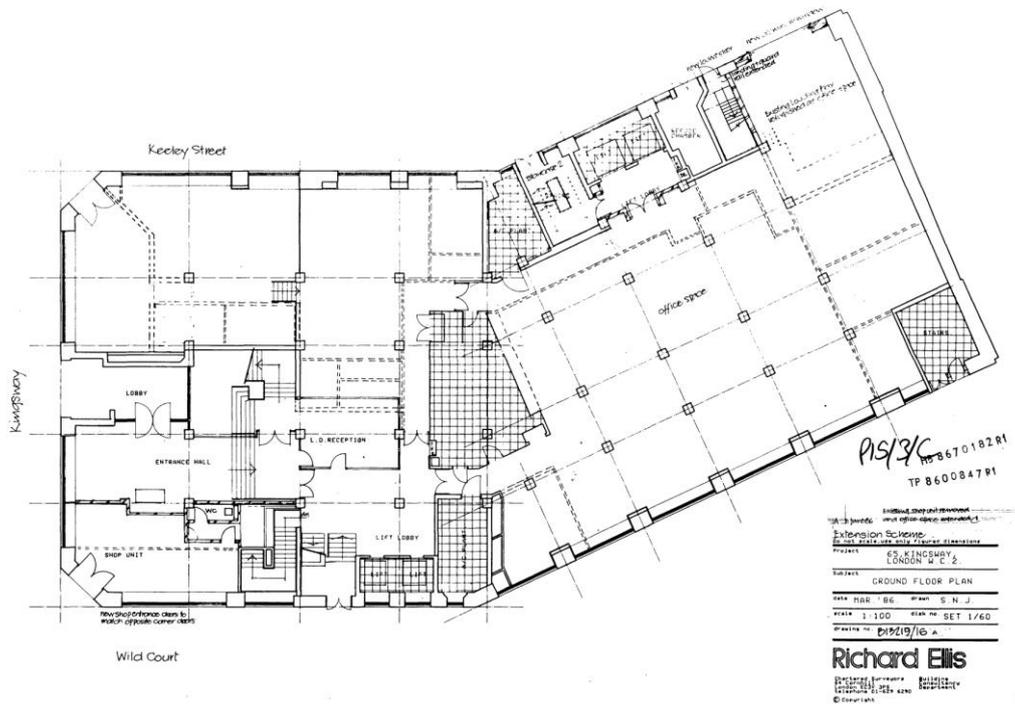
Extract from application 8600847 showing the proposed ground floor plan
